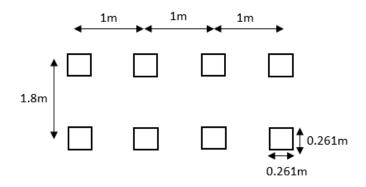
Wheel arrangement of HB vehicle that load transfer on to culvert
